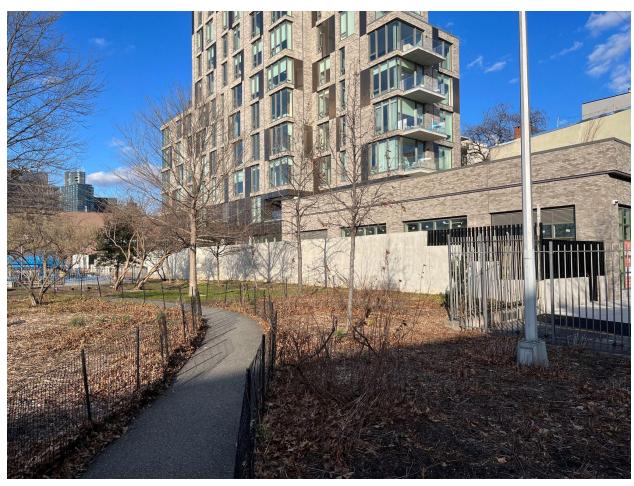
Existing 8' high concrete border wall on the eastern border of WNYC Transmitter Park (ground elevation is 13').
